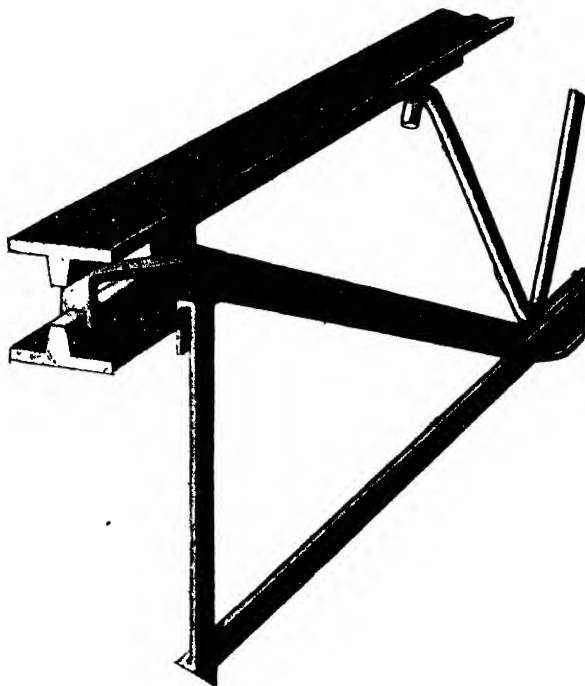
,690.—Typical ceiling extension used with open truss steel joists. When plastered ceilings are to be attached directly to the joists, ceiling extensions of the proper size must be provided at the ends of joists. These ceiling extensions are readily applied after the joists have been completely installed, and also permits the installation of pipes of considerable lengths adjacent to the supporting wall or structural member without interference. Two slots are provided in each end of each joist and the ceiling extension is slipped through the lower slot and hung in the upper one as illustrated.
